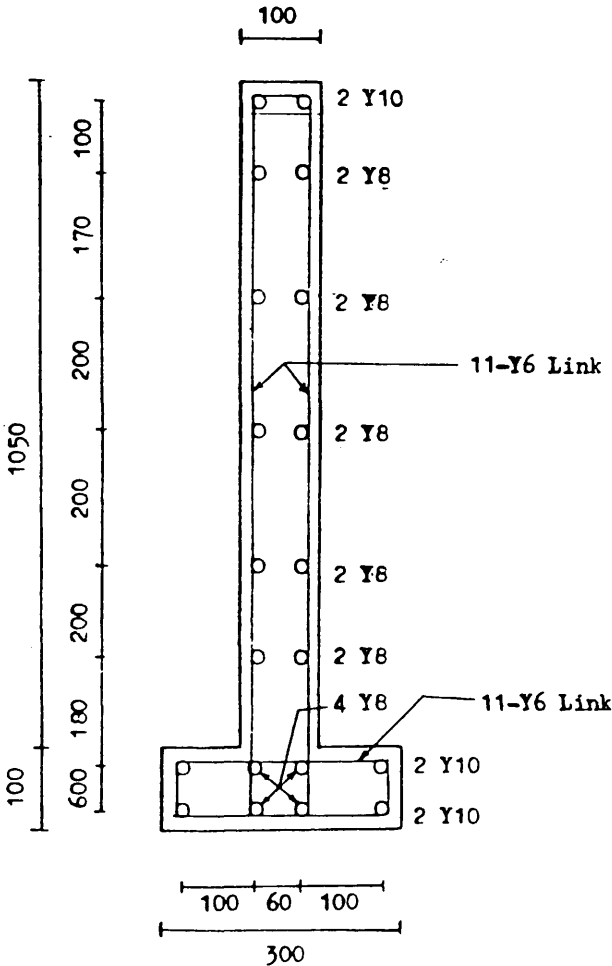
A horizontal section in the wall of model MRS13 showing the reinforcing details
